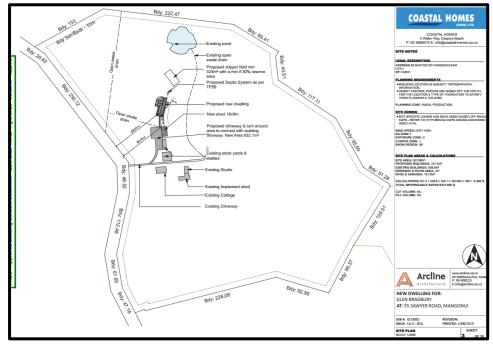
Approved site plan under EBC-2020-11042 showing three dwelling locations on the site.
